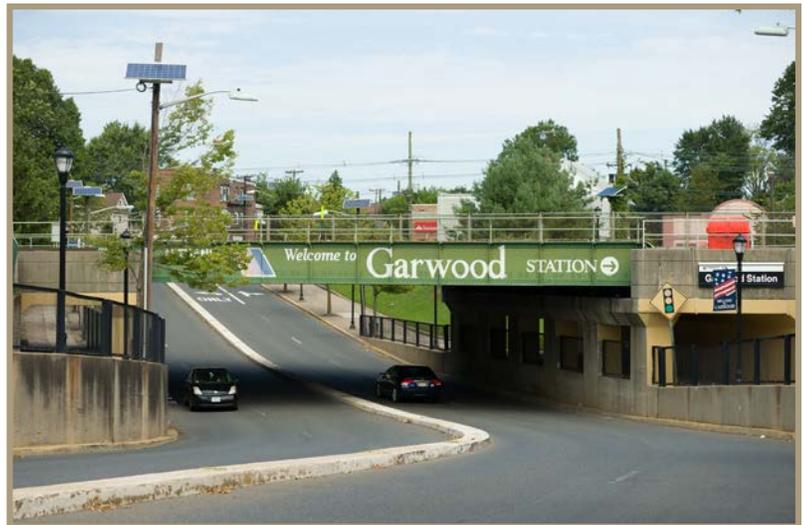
Looking north towards the railway bridge on Center Street. Note the poorly lit sidewalks under the bridge.
